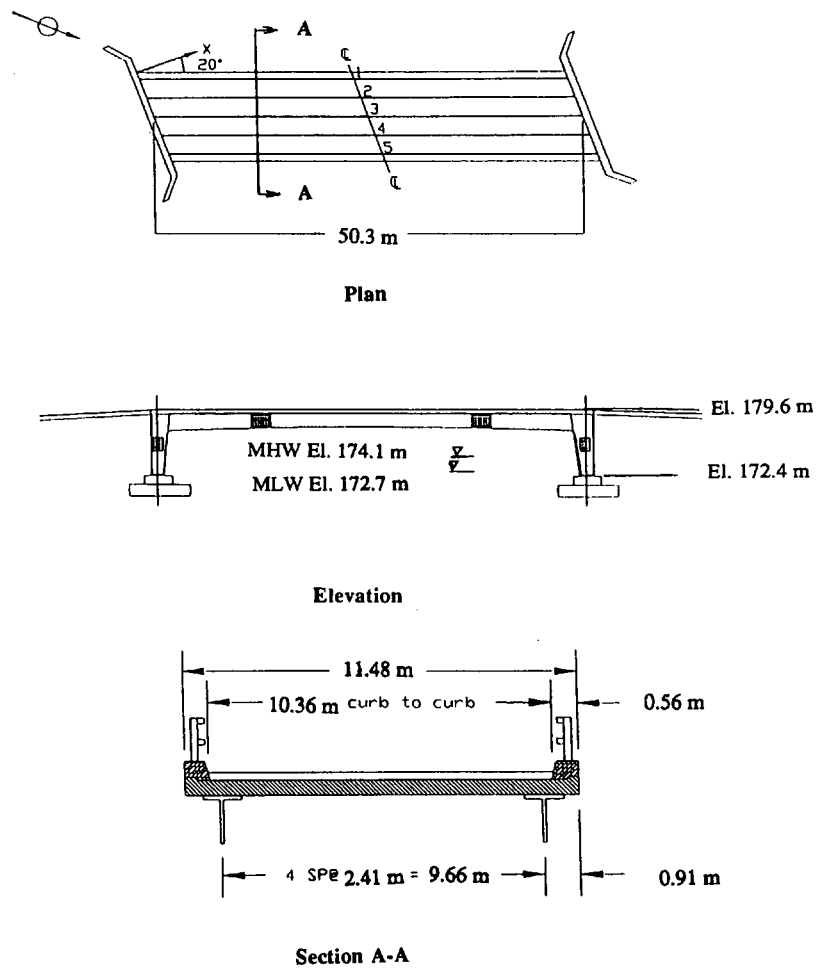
Plan, elevation, and section of The Forks Bridge.
